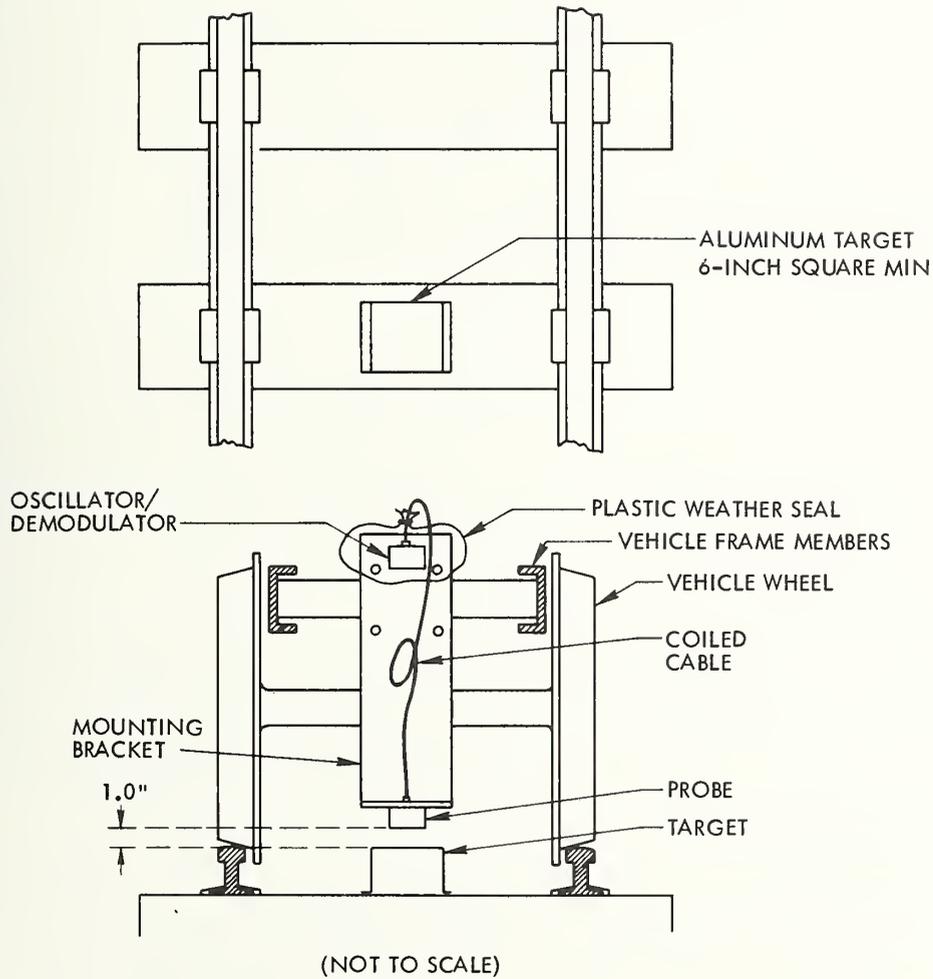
ALD TARGET/PROBE PLACEMENT
